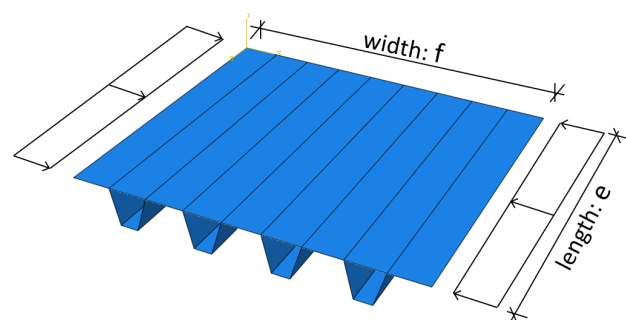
Plate stiffened with trapezoidal stiffeners, loaded transversely to the stiffeners.
